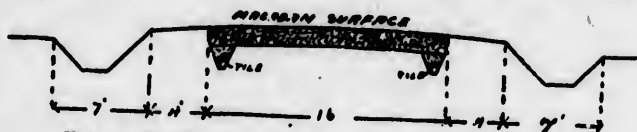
Showing Cross-Section of Road with Centre Drains.
